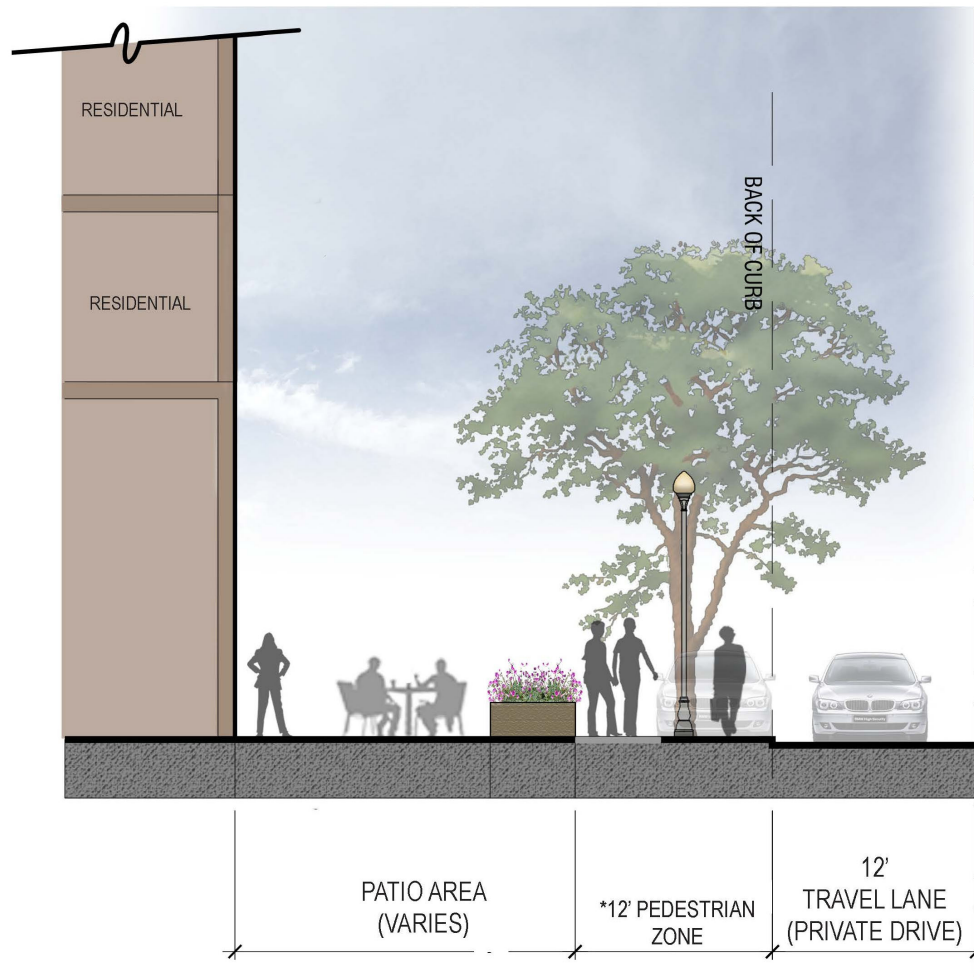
Typical Streetscape (Non-Residential Streetscape)
